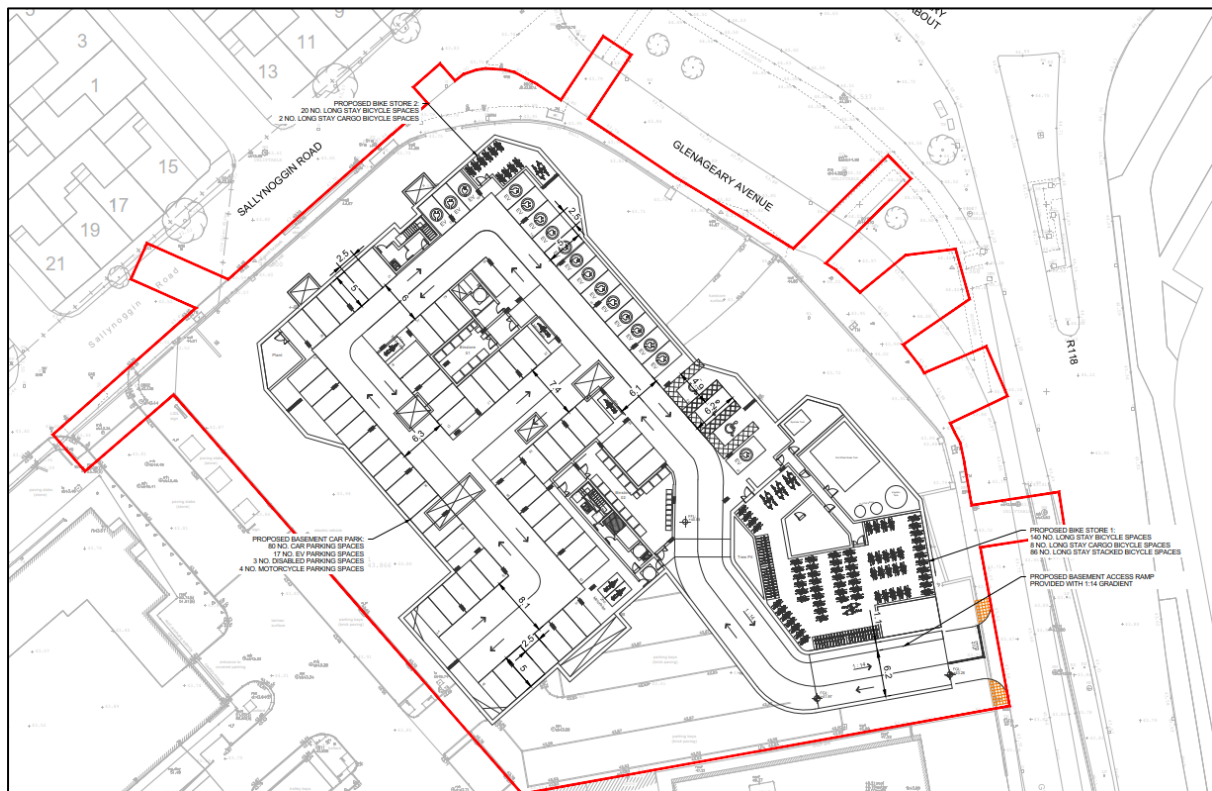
Proposed Basement Layout Indicating Main Bike Storage (AECOM Drawing 60690914-ACM-01-00-DR-CE-10-0002)
